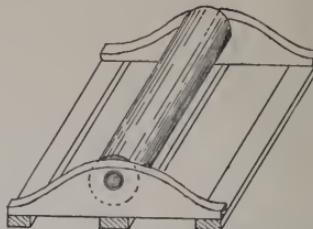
ROLLER FOR USE ON FLOOR BEAMS.
